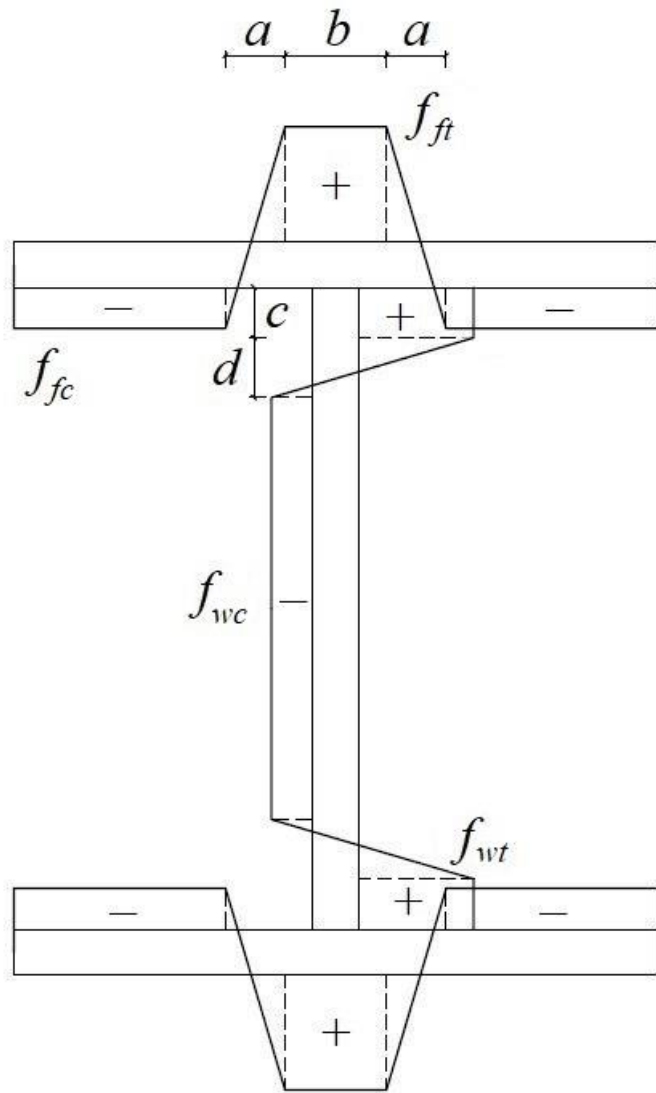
General membrane residual stress pattern for welded I-sections [3].
